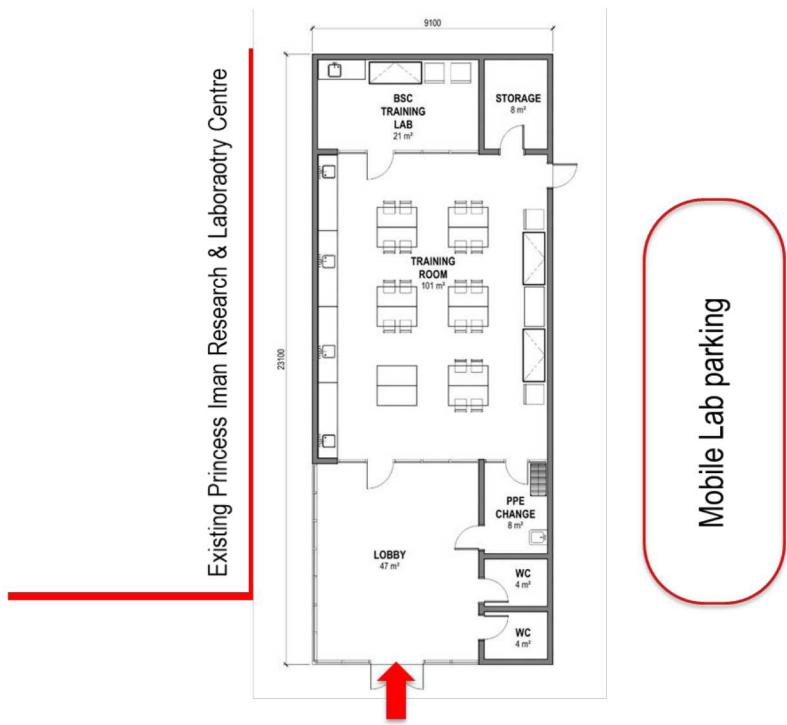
Option 4 – New Construction near the existing mobile lab parking area
